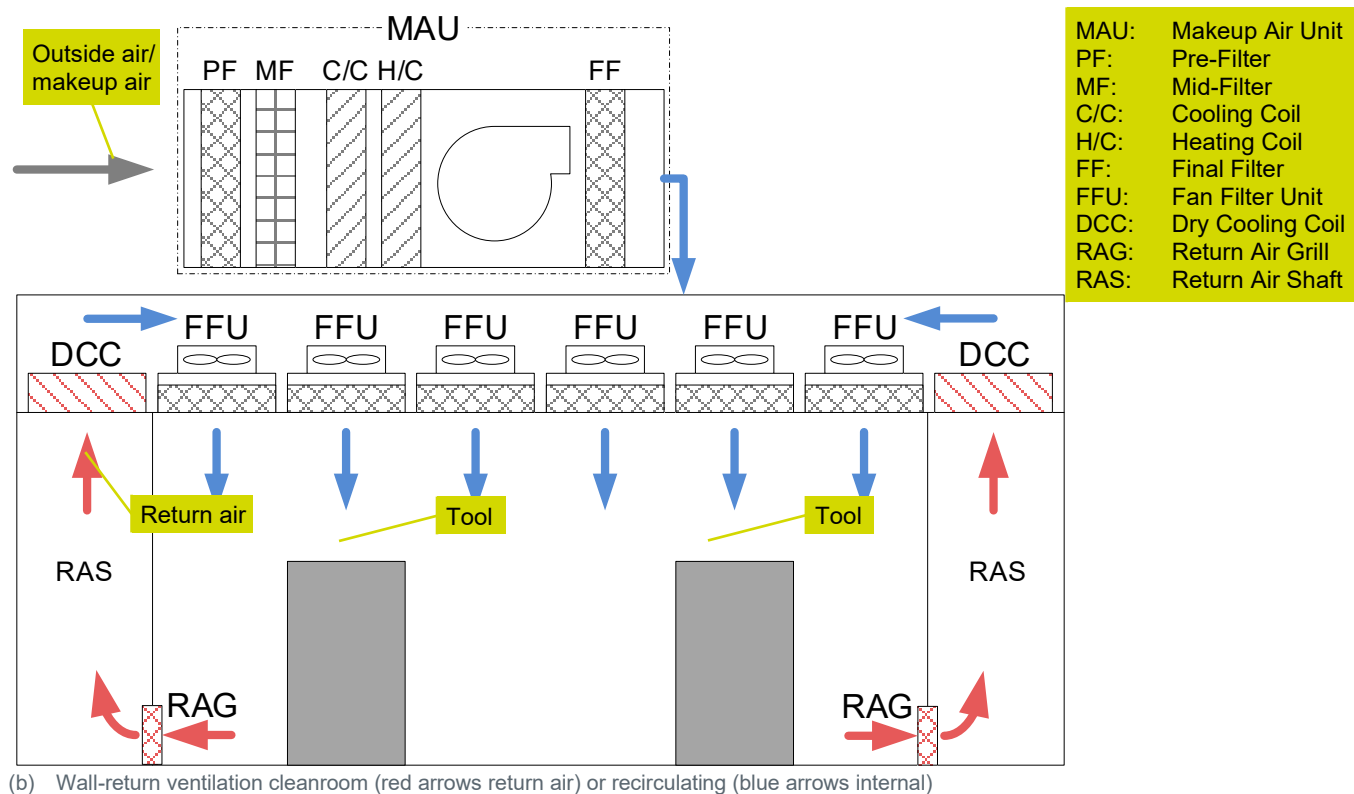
Air circulation/exhaust ventilation cleanroom with raised floor, wall RAS or FDCU
